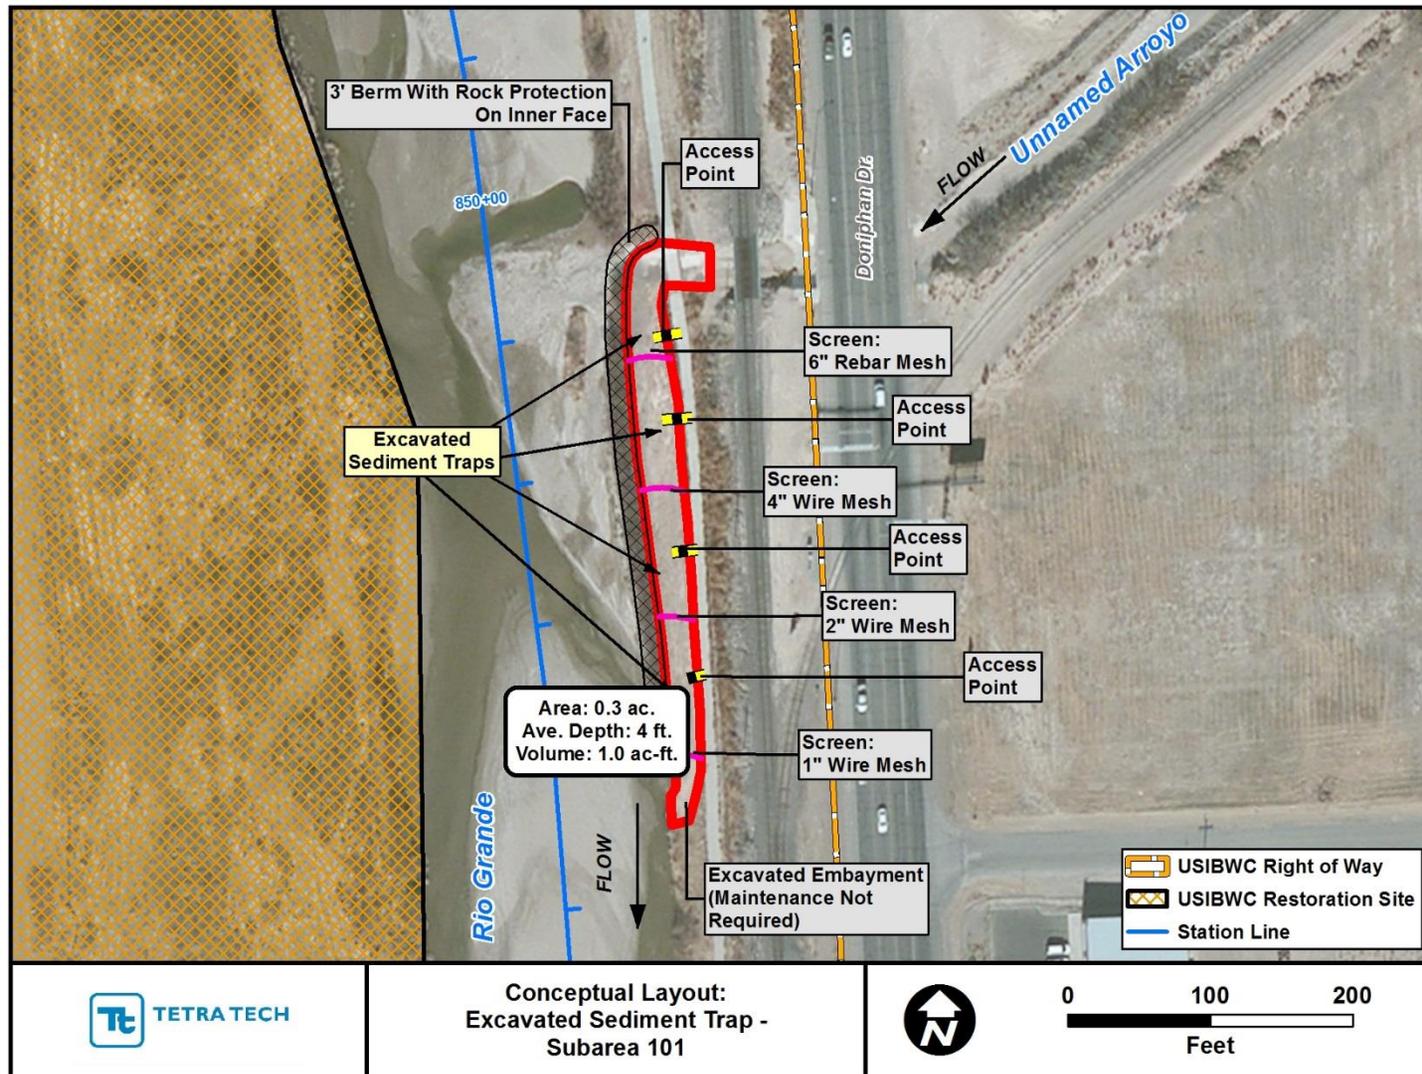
Conceptual layout of sediment trap for the unnamed arroyo draining Subarea 101 at Problem Location 7.
